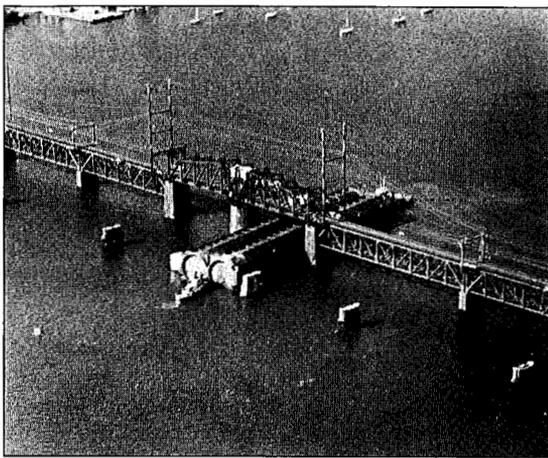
Towing a tube section to the outfitting site for the Fort McHenry Tunnel. Bridge clearances were extremely tight.
